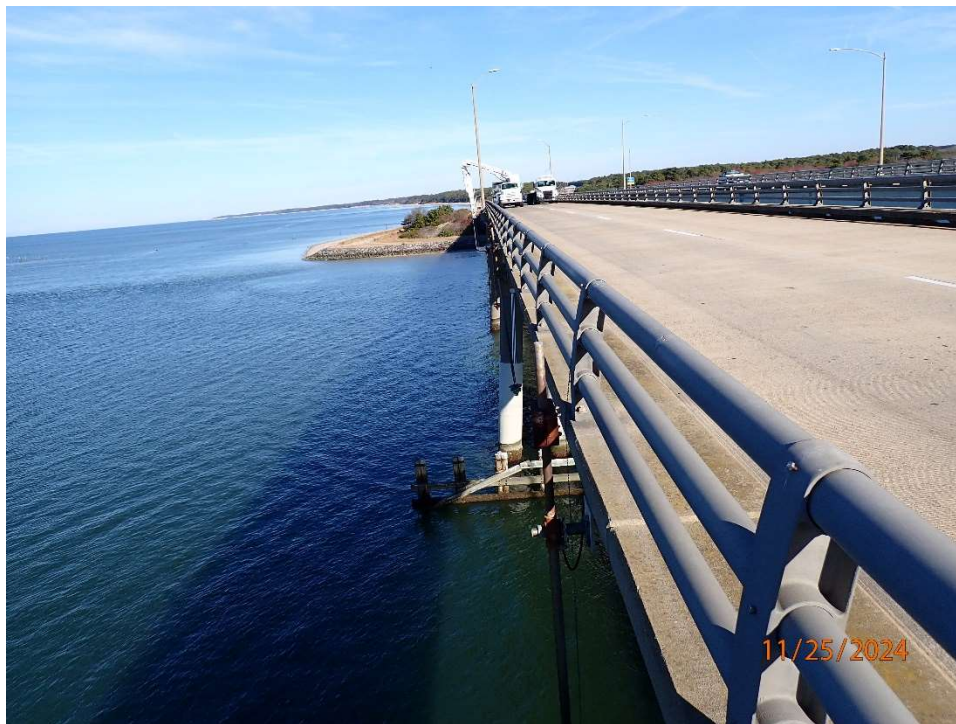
FIBSB2 Railing in good condition and navigation lights with light surface rust.
